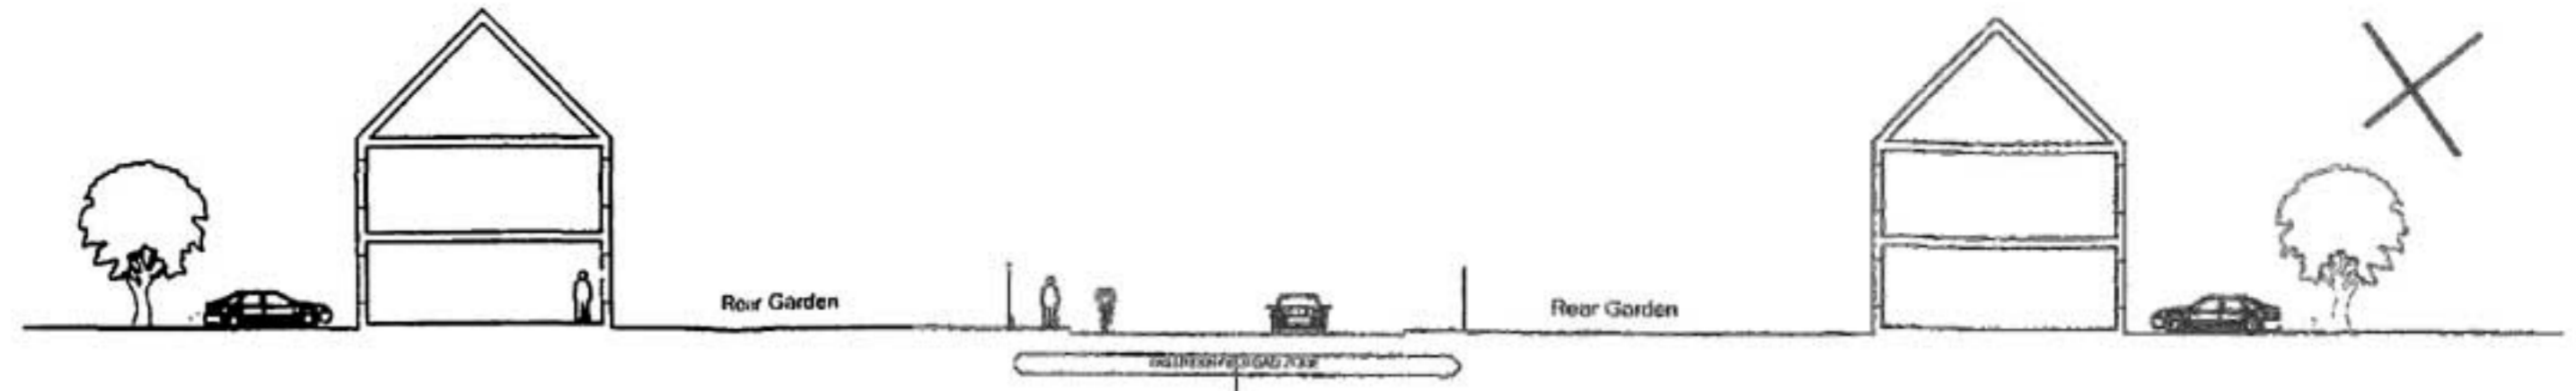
A preferred layout for Suburban Distributor Roads
